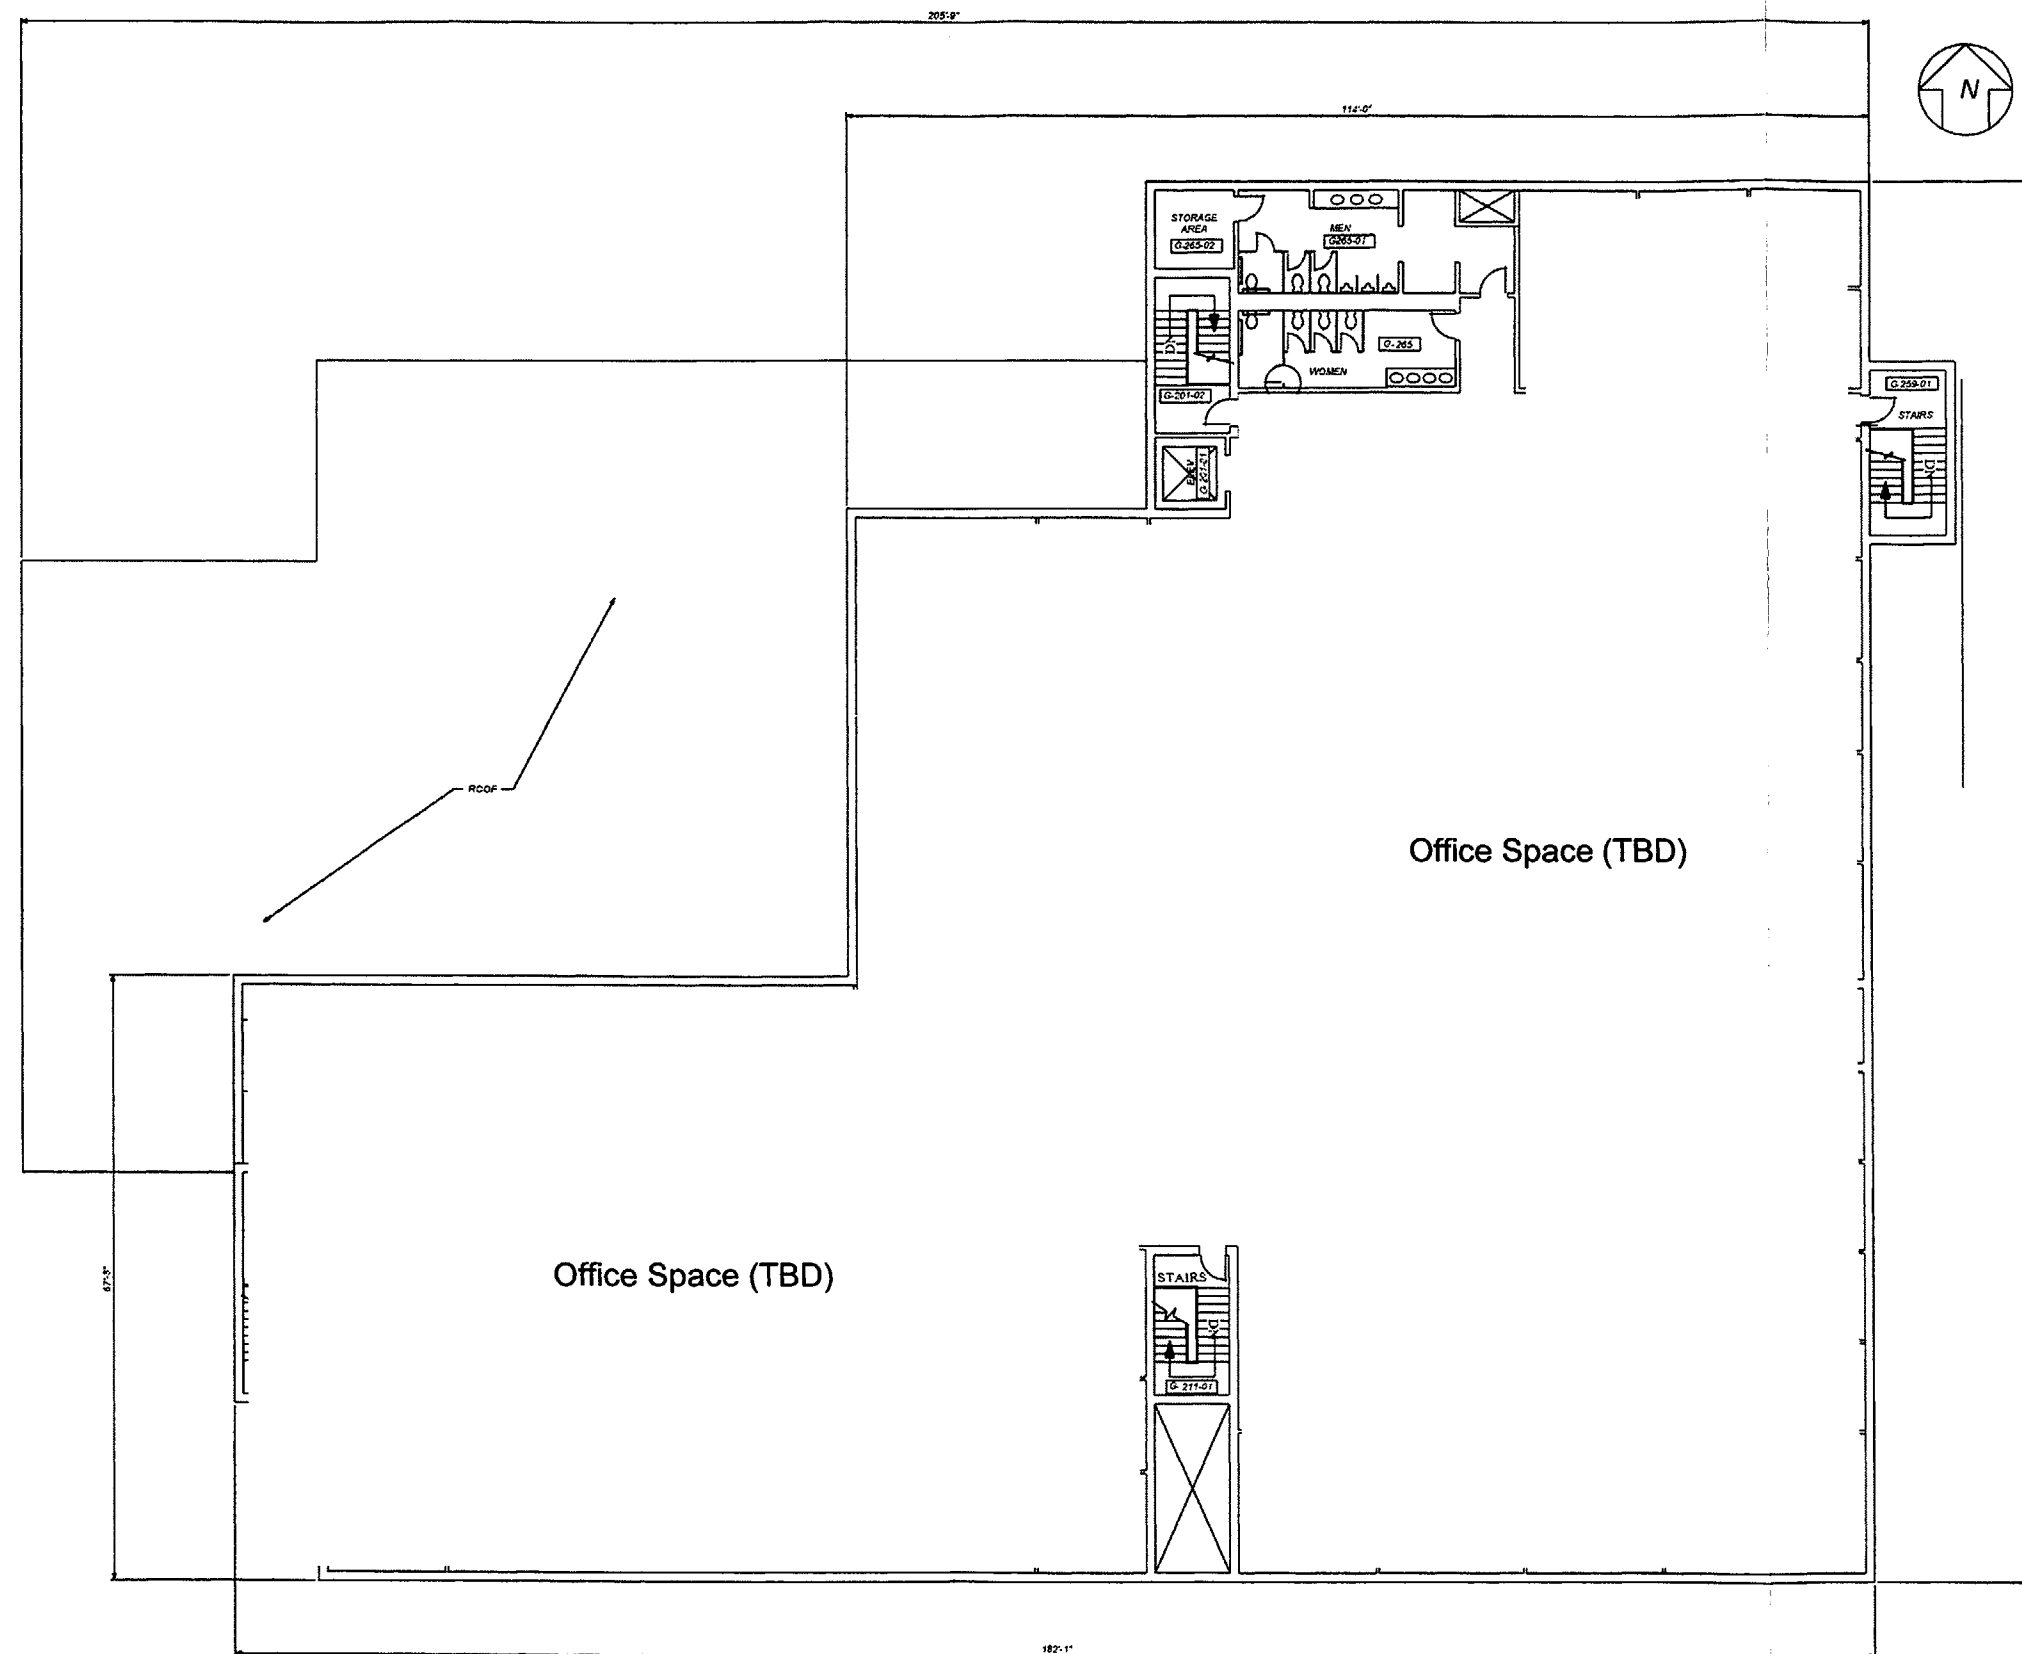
General Arrangement – Technical Support Building (BTS) Conceptual Layout – Second Floor
